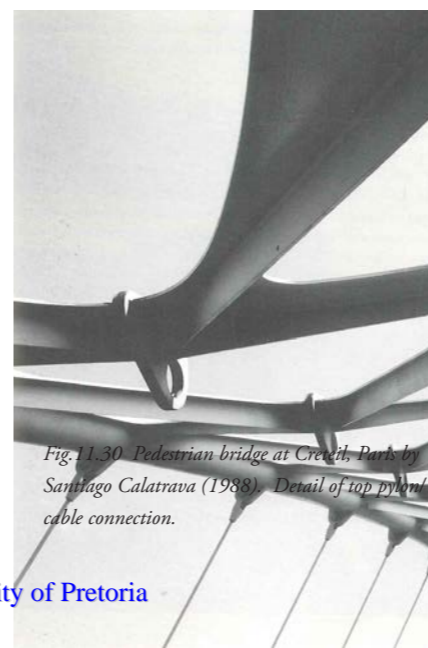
Pedestrian bridge at Credit, Paris by Santiago Calatrava (1988). Detail of top pylon/cable connection.
